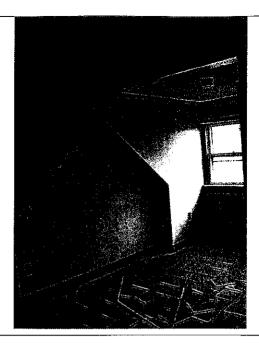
04/27/05 - Men's Annex (Building #15): Central Stair
